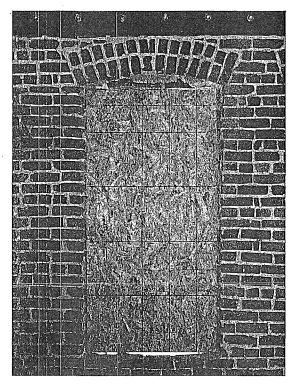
Detail view of typical punched window opening at western wall. Note arched brick lintel (photograph taken on 02/27/2018).
